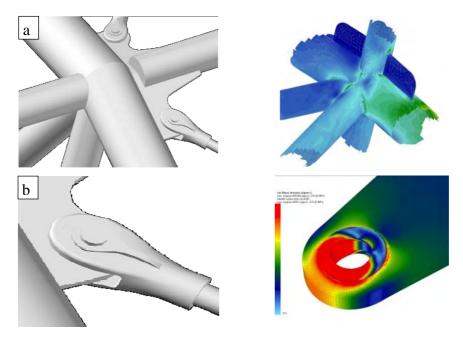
CAD visualization, shell nad bricks FEM model: a – typical node; b – connection of bracing
